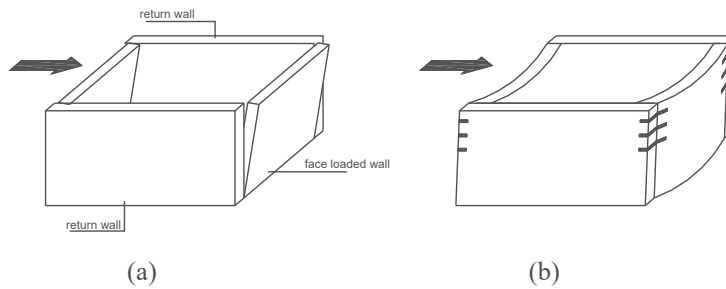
The level of wall-to-wall connection has a significant effect on the structural response of a masonry building under the effect of an earthquake: (a) unconnected wall panels: in this situation the out-of-plane collapse of face loaded walls is likely to occur, (b) well-connected wall panels: loads are transferred to return walls, able to resist better to the seismic action, thus increasing the seismic capacity of the building.
